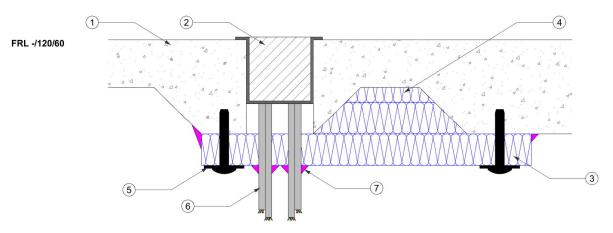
Electrical floorbox recessed in ComFlor® system with cable bundles penetrating 1 \times 50 mm Boss® batts
